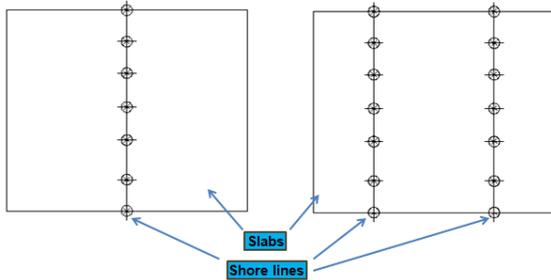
Plan view of a slab with (a) a single line of shores and (b) double line of shores
